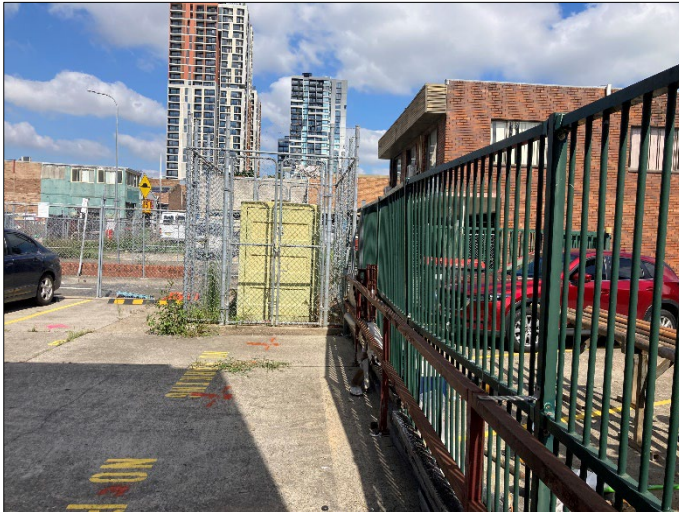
West View: West Elevation of Block 229-239 Pitt St
